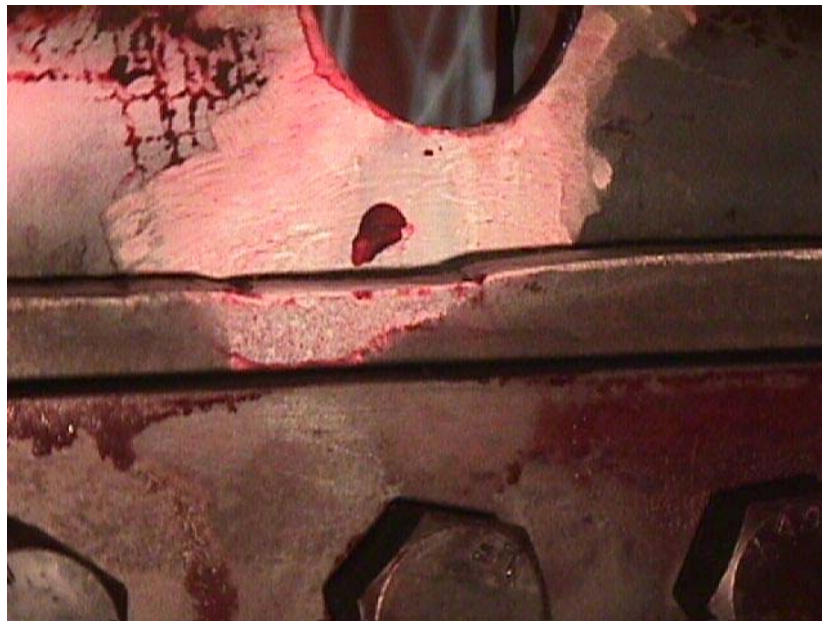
Re-initiation of crack from internal weld defect.
